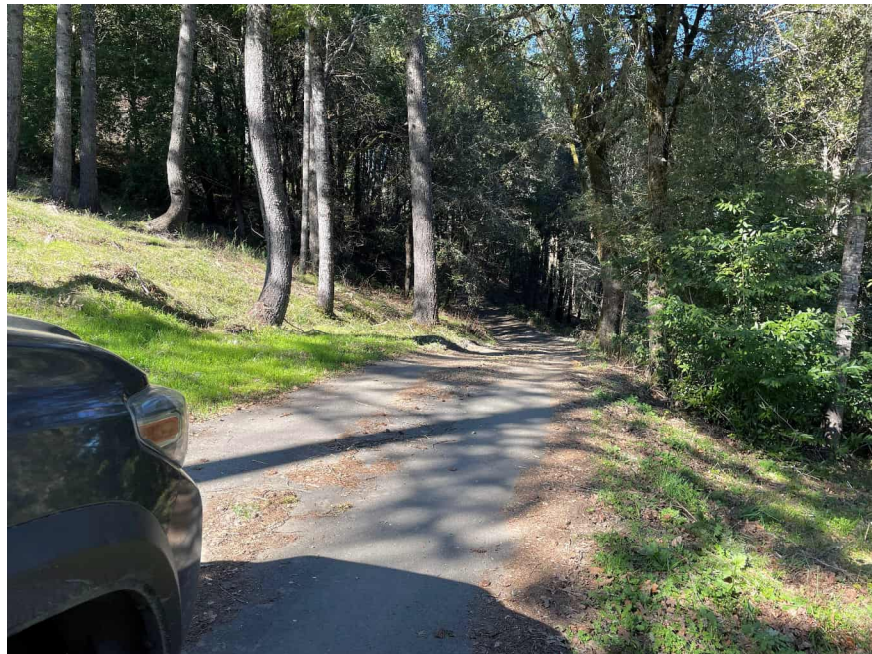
RP 9. Private Driveway – 12' paved road width. shown facing north; towards Milky Way Loop.
